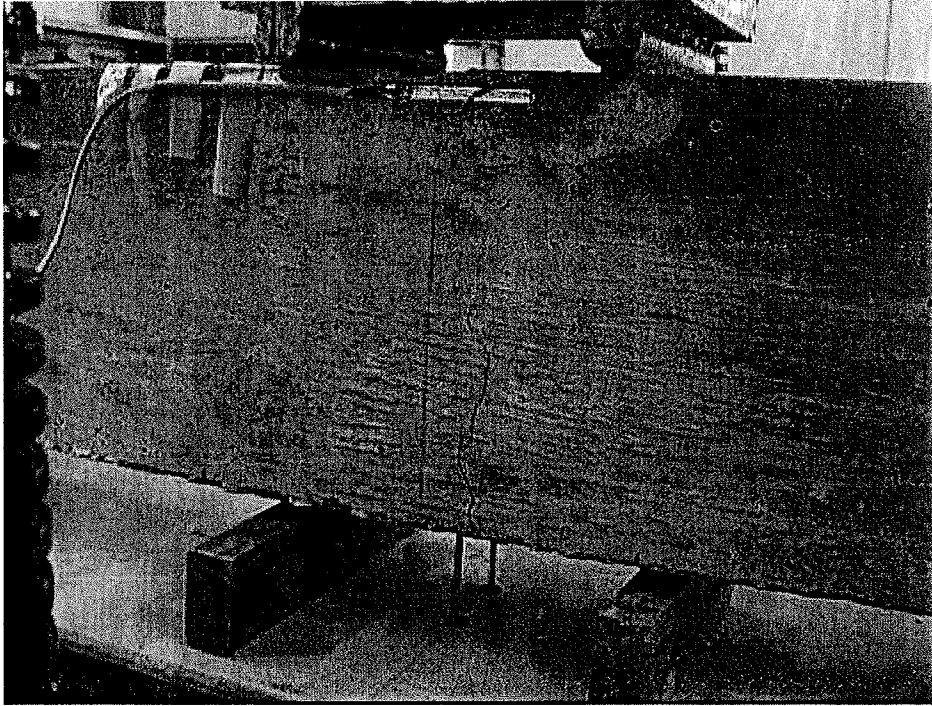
BRC -3 beam at failure, the photograph shows that the beam failed by primary flexural failure and secondary shear failure.
